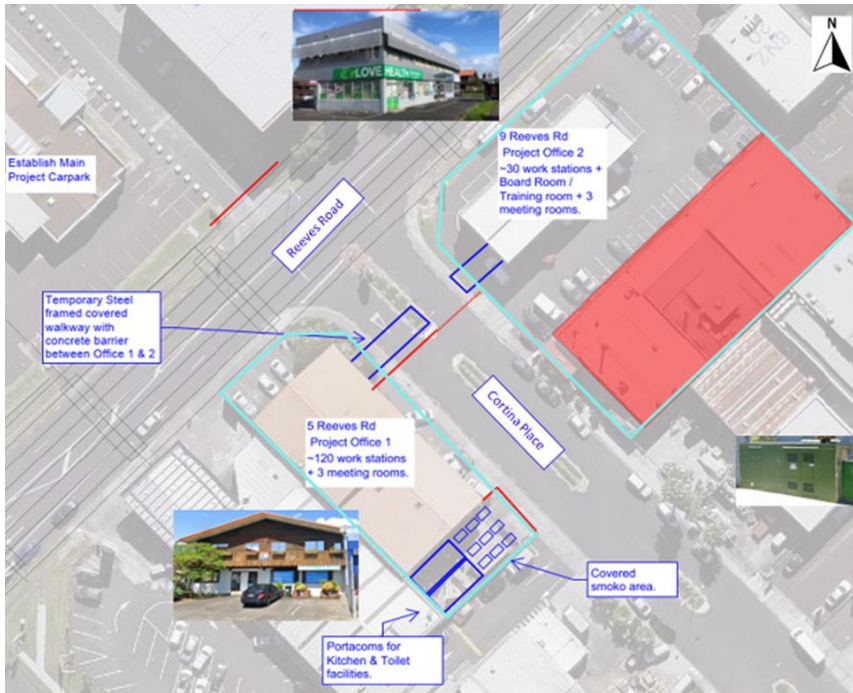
Location of Reeves Road Satellite Offices¹⁶ 5 Reeves Road will also be used to house a bentonite/polymer slurry plant, which will produce bentonite/polymer for the RRF’s construction (Figure 4-25). The plant will consist of 40 FT containers, pumps and valves which are approximately 36m by 14m. There will be several Jinker Carrying Super Tee’s required for the functioning of the plant. The plant will include a sediment tank and desander that removes impurities from the bentonite so that material can be recycled and used again. The plant will operate for approximately nine months, commencing July 2023.
